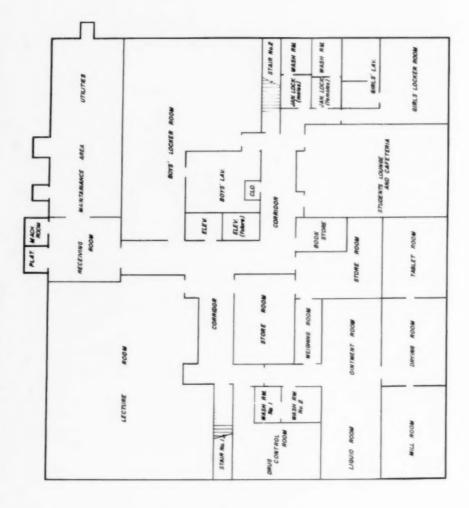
First Floor Plan, School of Pharmacy, University of Maryland
